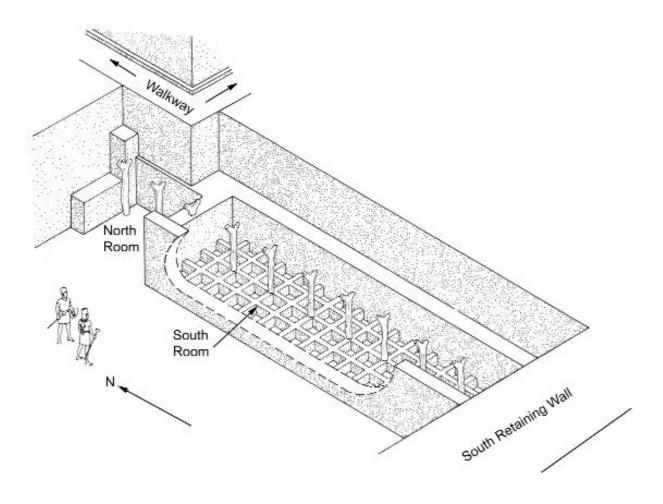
STAGE 5: The west wall of the North Room and the bins on its floor were dismantled.
